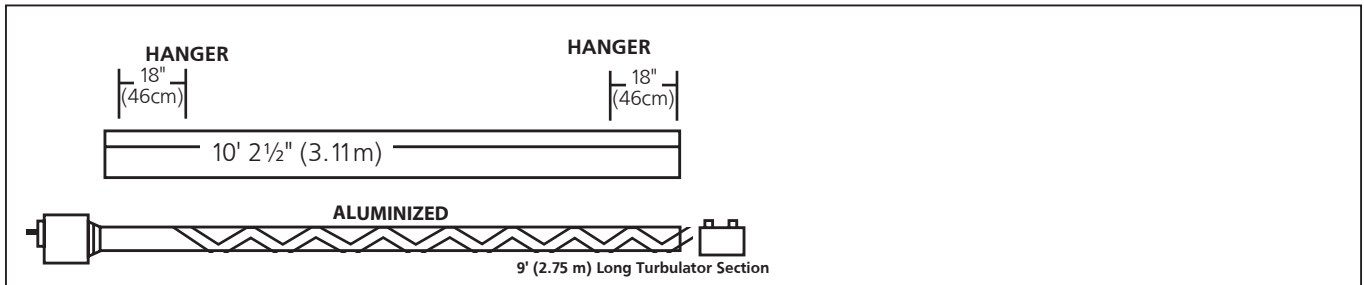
B: Ener-Radiant SP Model ERSP-60, ERSP-80, Assembly Overview
